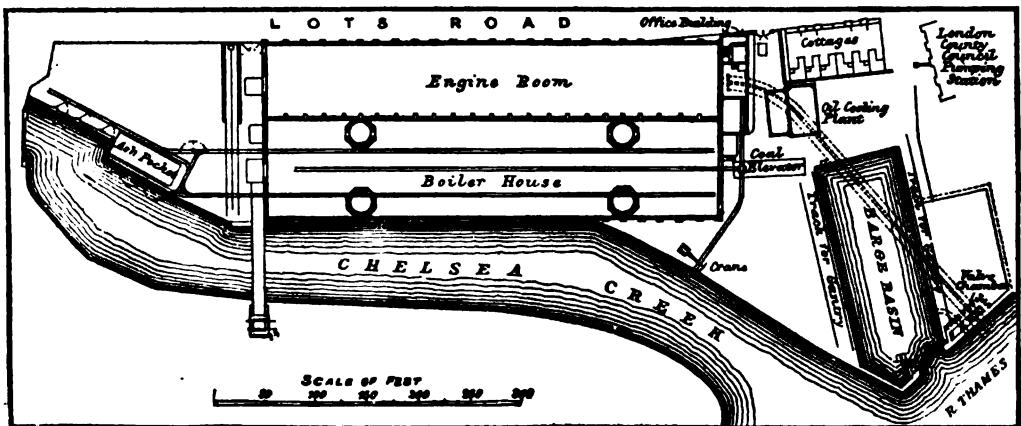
General Plan, Chelsea Plant, London (*The Tramway and Railway World*).
